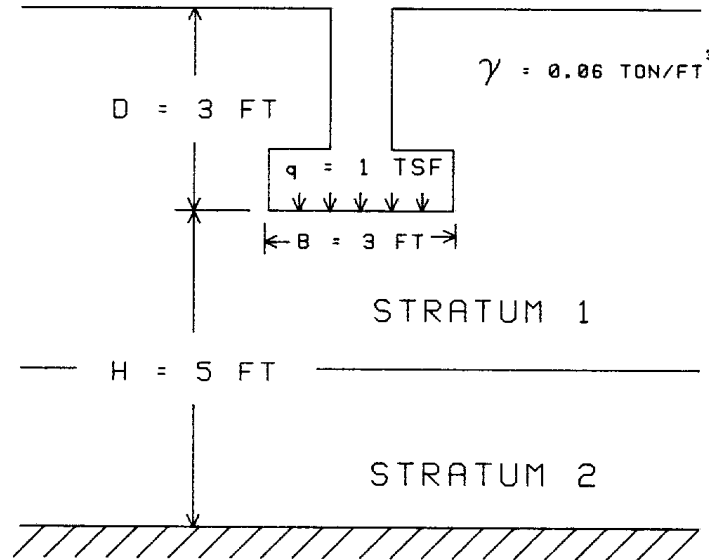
Illustration of footing for calculating settlement on collapsible soil
